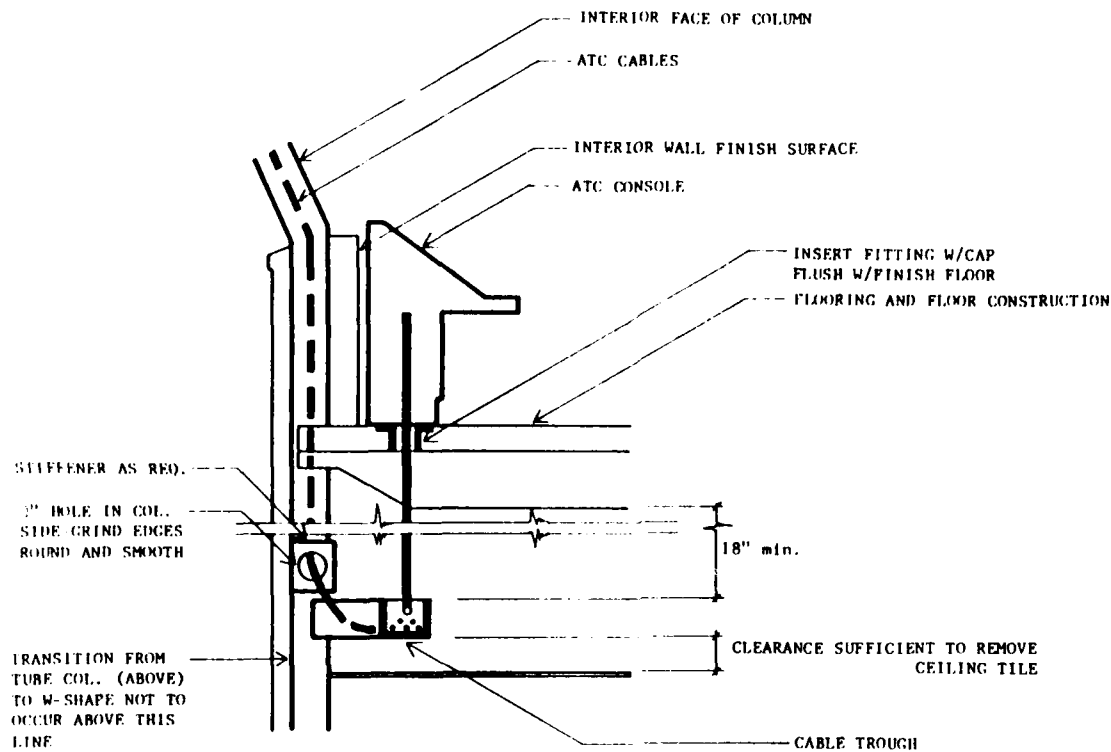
Scheme two--ATC cable trough layout (above support floor ceiling).
